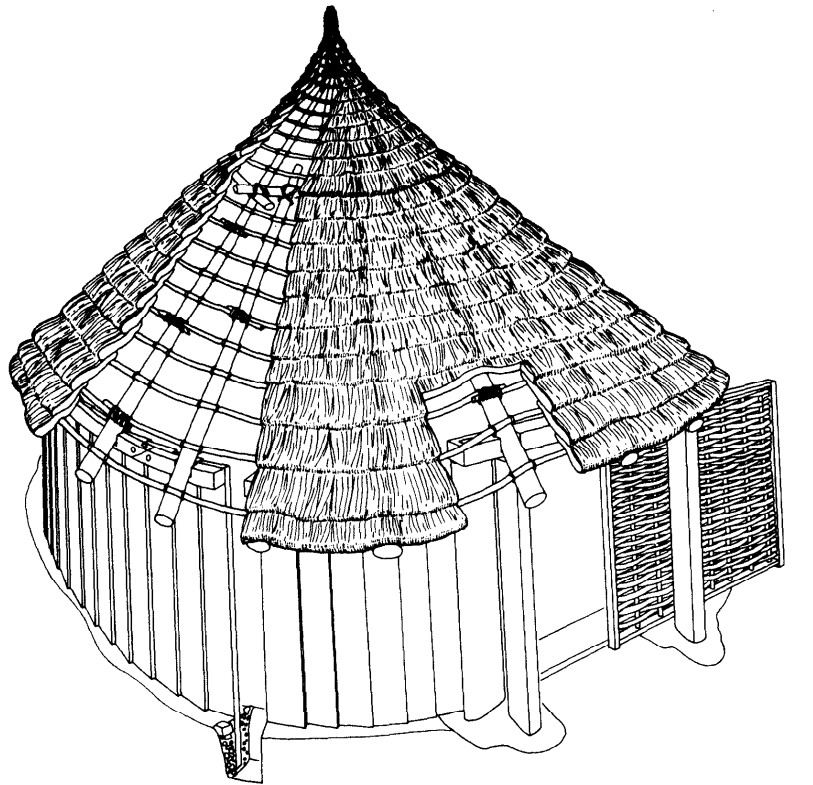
Reconstructions of plank-built and stake-built houses (by Chris Unwin)
